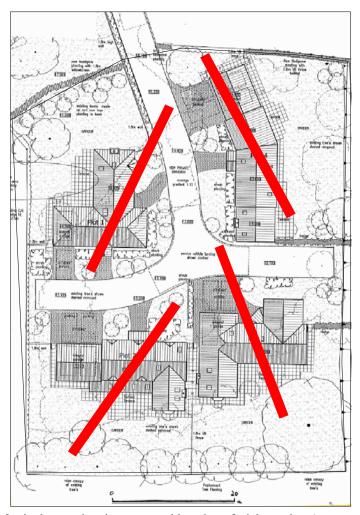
site layout showing proposed location of trial trenches (not to scale)
